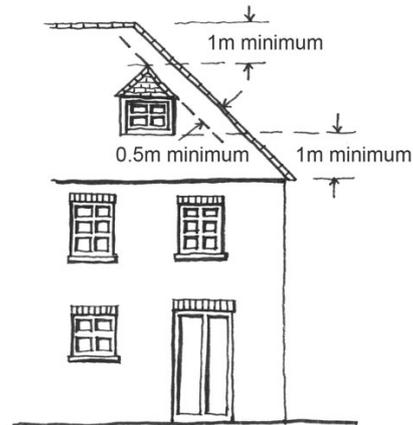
Dormer windows should be well away from the hipped part of the roof.
